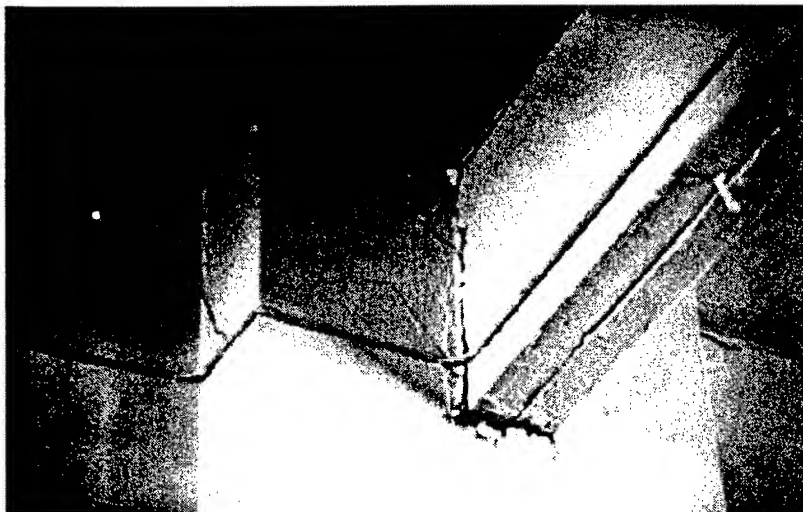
Cracking at beam/pilaster connection.
